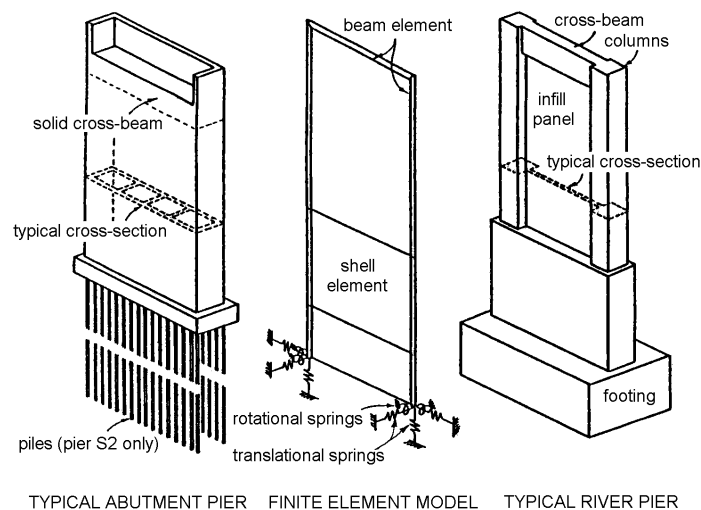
Typical piers and a finite element pier model of Queensborough Bridge (18).
